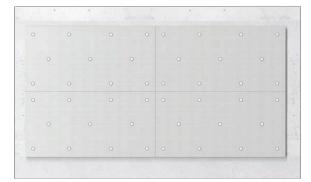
Board joints aligned. Fastener pattern (11 fixings per board)
